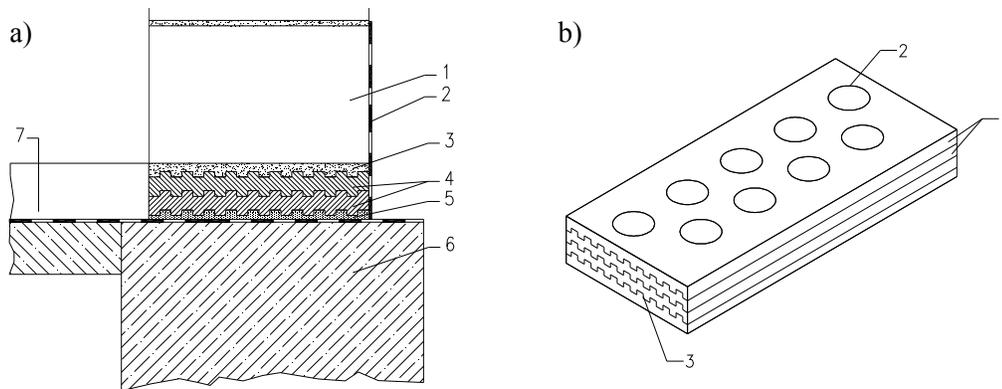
Insulating Block; 1 - Masonry, 2 - Water-proofing, 3 - Cement Mortar or Concrete, 4 - Insulating Block, 5 - Paste, 6 - Foundation, 7 - Floor
